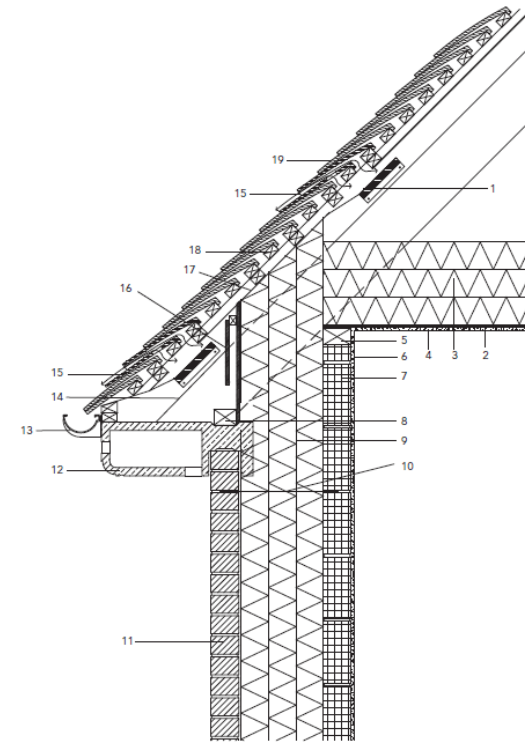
Example of build up in roof space for crevice dwelling bats in an insulated roof space.
